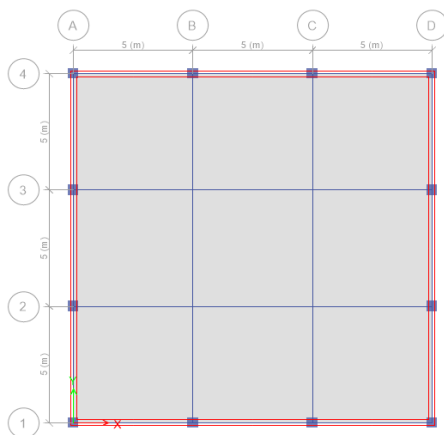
(a) Plan view of ETABS Model For RCC and Composite Elevated Water Tank.
